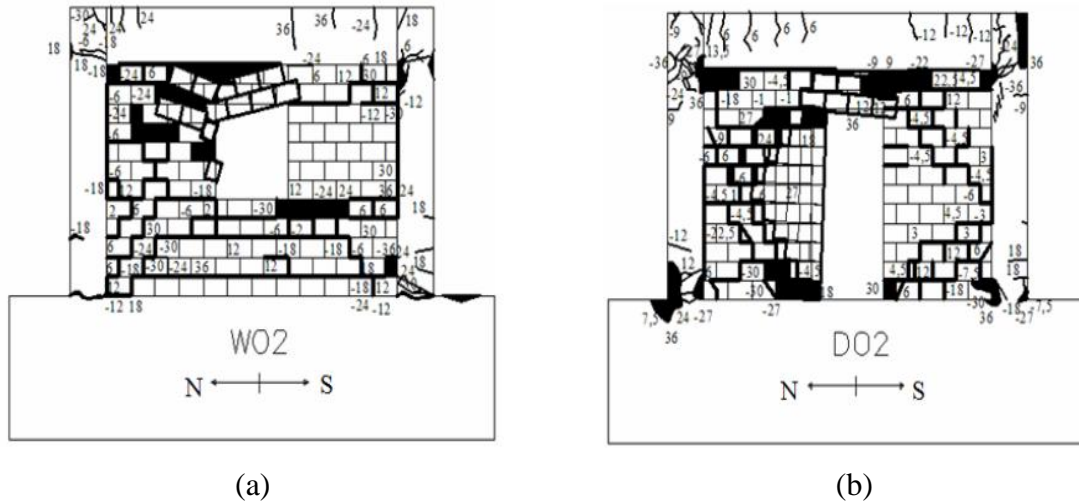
Crack pattern in masonry-infilled RC frame with: (a) central window opening, and (b) central door opening (Kakaletsis and Karayannis 2009).
